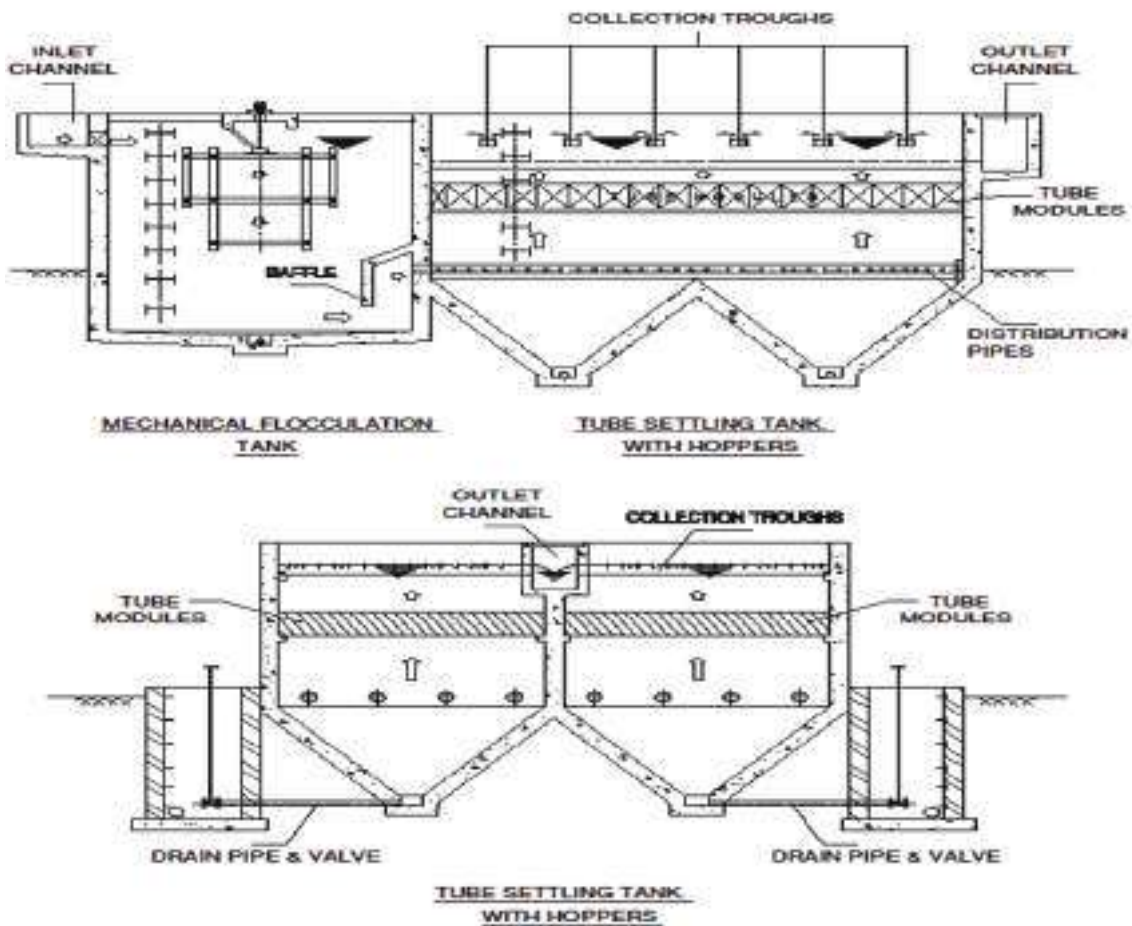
Typical Details of External Flocculation Tanks and Tube Settling Tanks with hopper bottom
